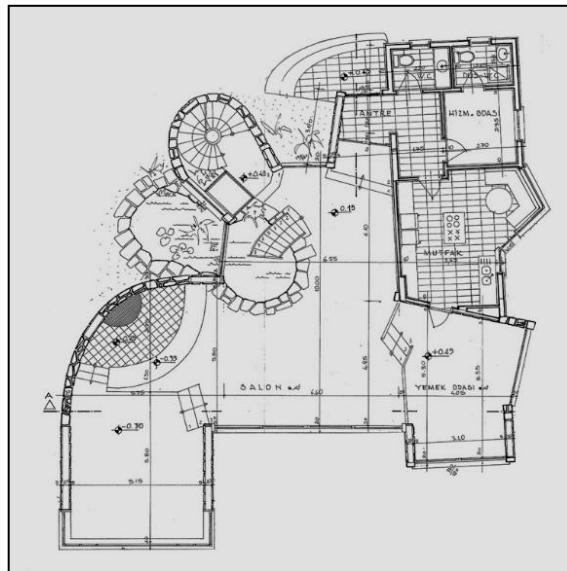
Floor plan of Çamlı street, no:63 [157] (n)
